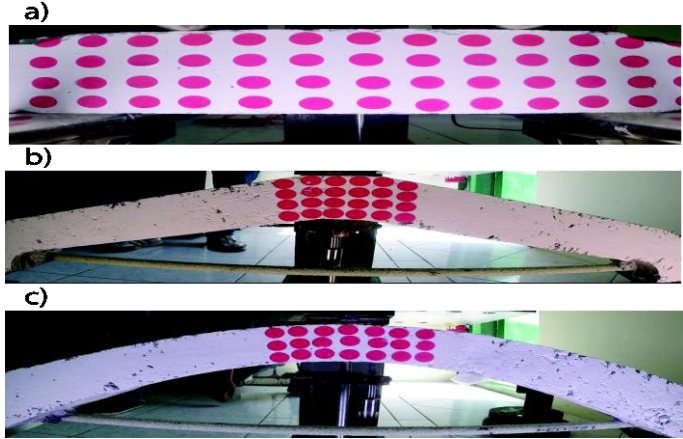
Images captured with the digital camera from each analyzed geometry. (a) Plain concrete beam; (b) Reinforced concrete triangle; (c) Reinforced concrete arch.
